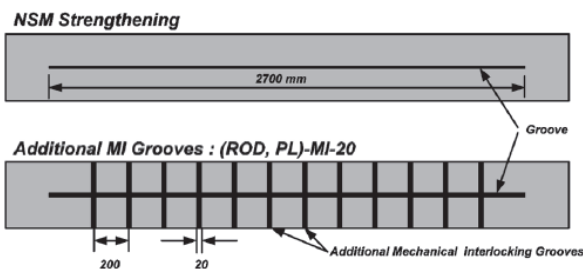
Bottom schemes of RC beams strengthened with NSM reinforcement (mm)
